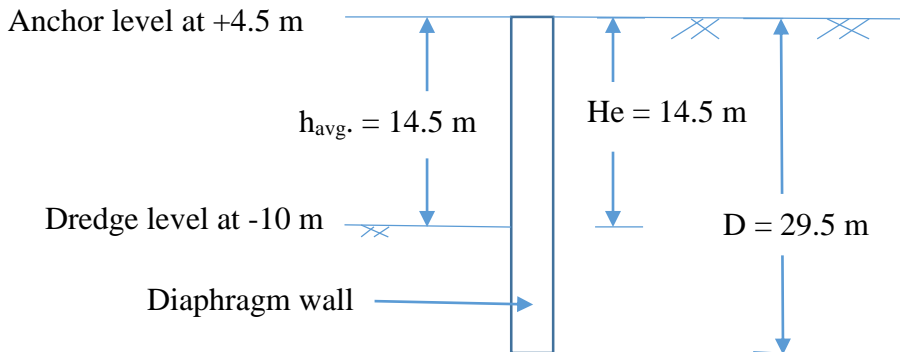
Diaphragm wall with anchor at +4.5 m
